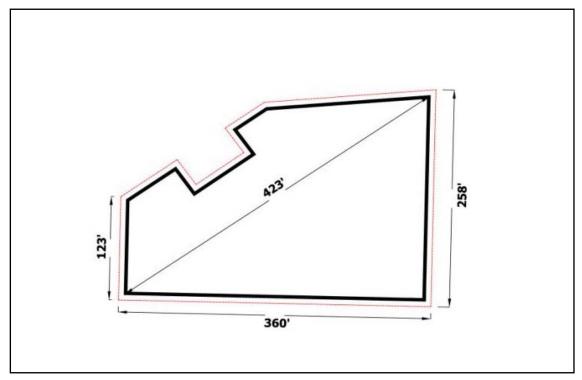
Alternative 2 - Soldier pile bulkhead at Existing Dewatering Site.
